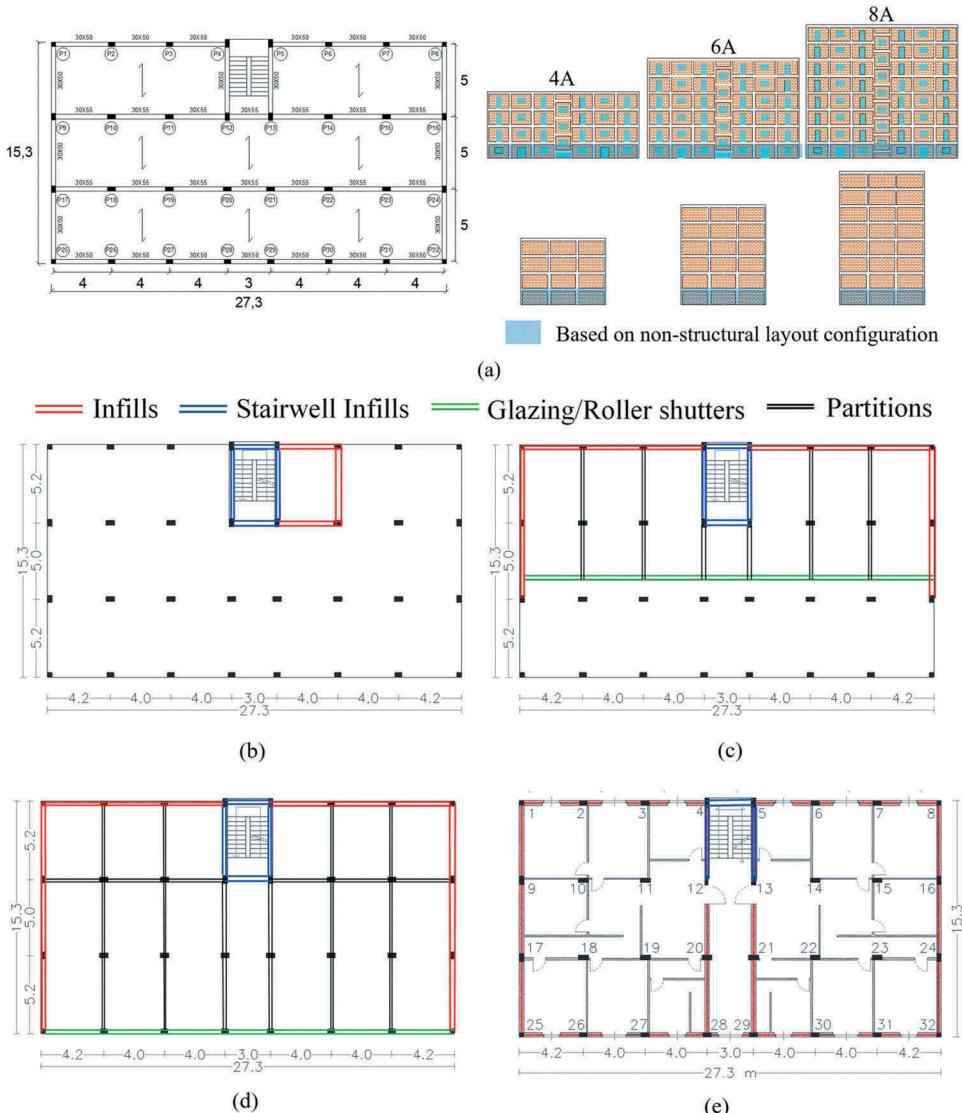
(a) Front view and plan view of the archetype pre-70 RC frame buildings investigated in Cardone, Gesualdi, and Perrone (2019); First-storey non-structural layout configurations considered in this study: (b) pilotis-type (i.e. no infill); (c) retail (partially infilled); and (d) garage (fully infilled); (e) upper storeys typical layout for residential use.
